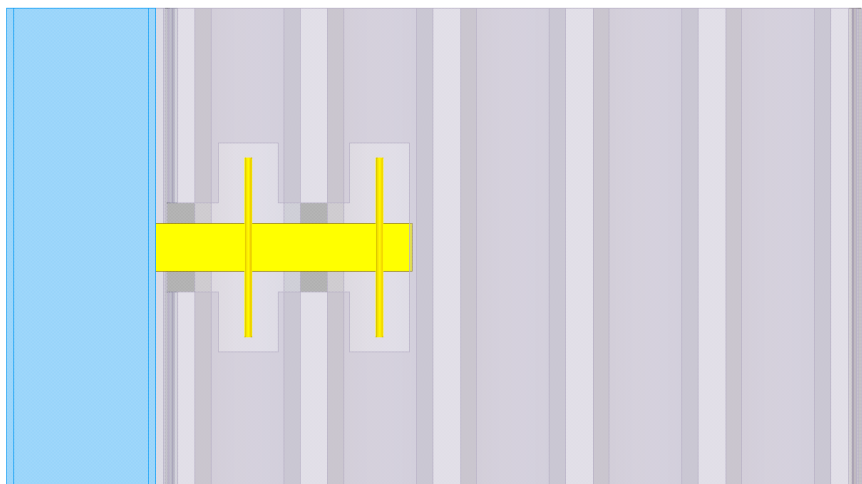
The studied connection includes a steel beam, a hollow core element and the steel component KBA-5.
